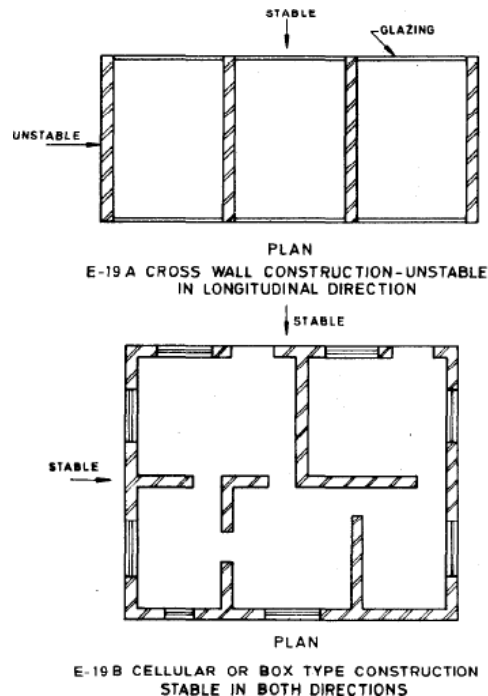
Stability Of Cross Wall and Cellular (Box Type) Construction
